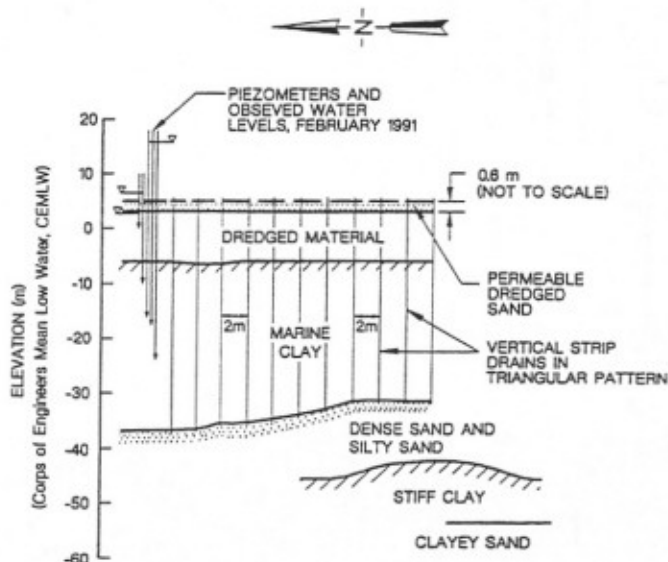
Subsurface Profile at Prefabricated Vertical-Drain Test Section
